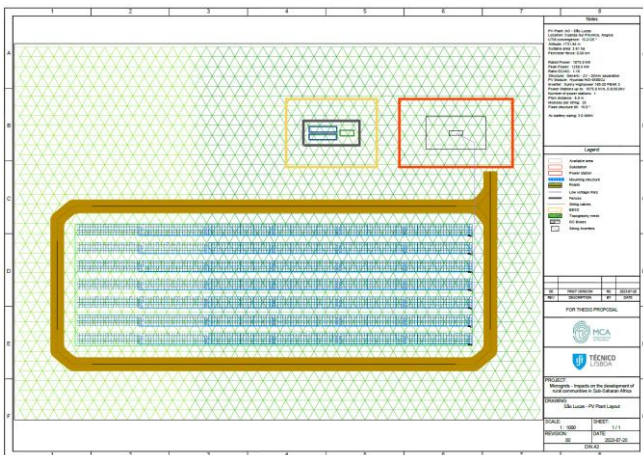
São Lucas PV Park Layout (Source: PVCase)
